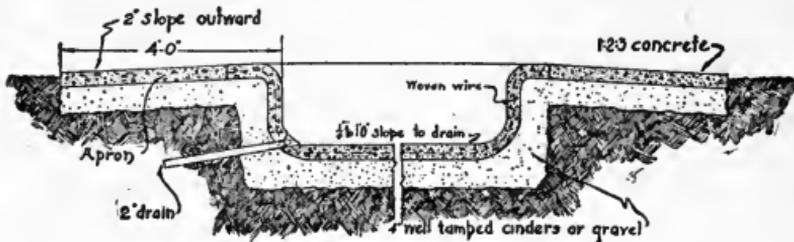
Concrete Hog Wallow, Showing Drain Pipe
